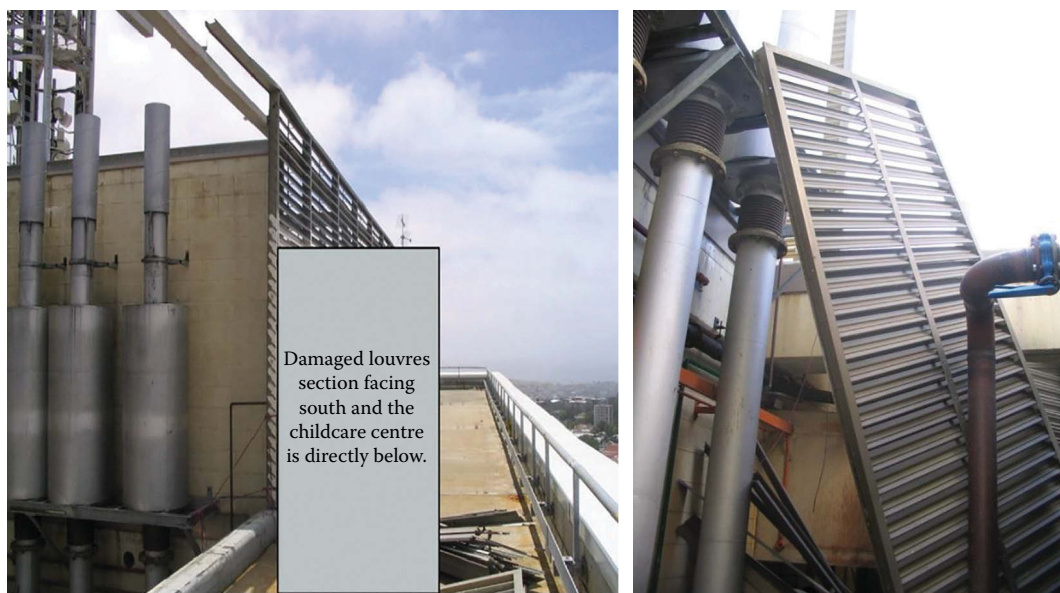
Damaged louver section on southwest corner of roof on Level 29
